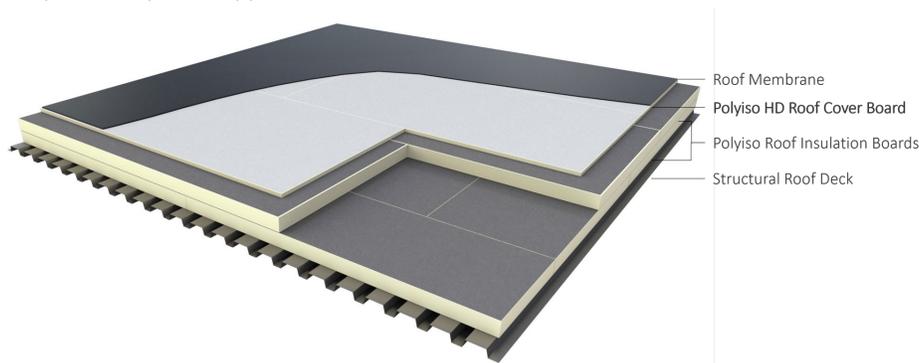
Typical roof assembly with polyiso HD roof cover board installed between the insulation and the roof membrane.
